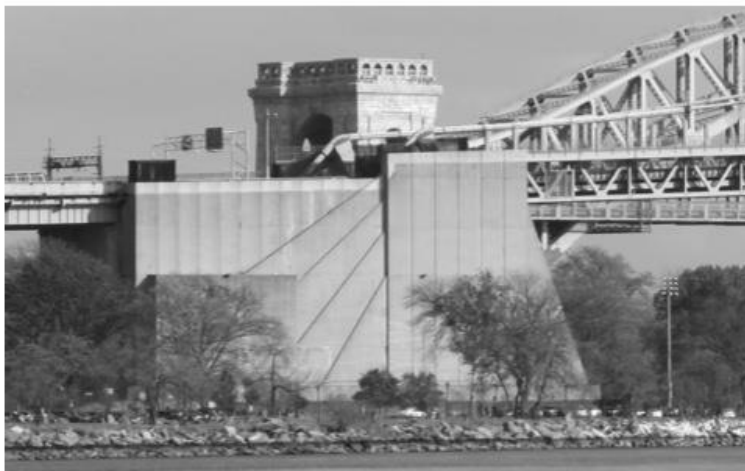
Typical anchor block with splay saddle and bent strut.
